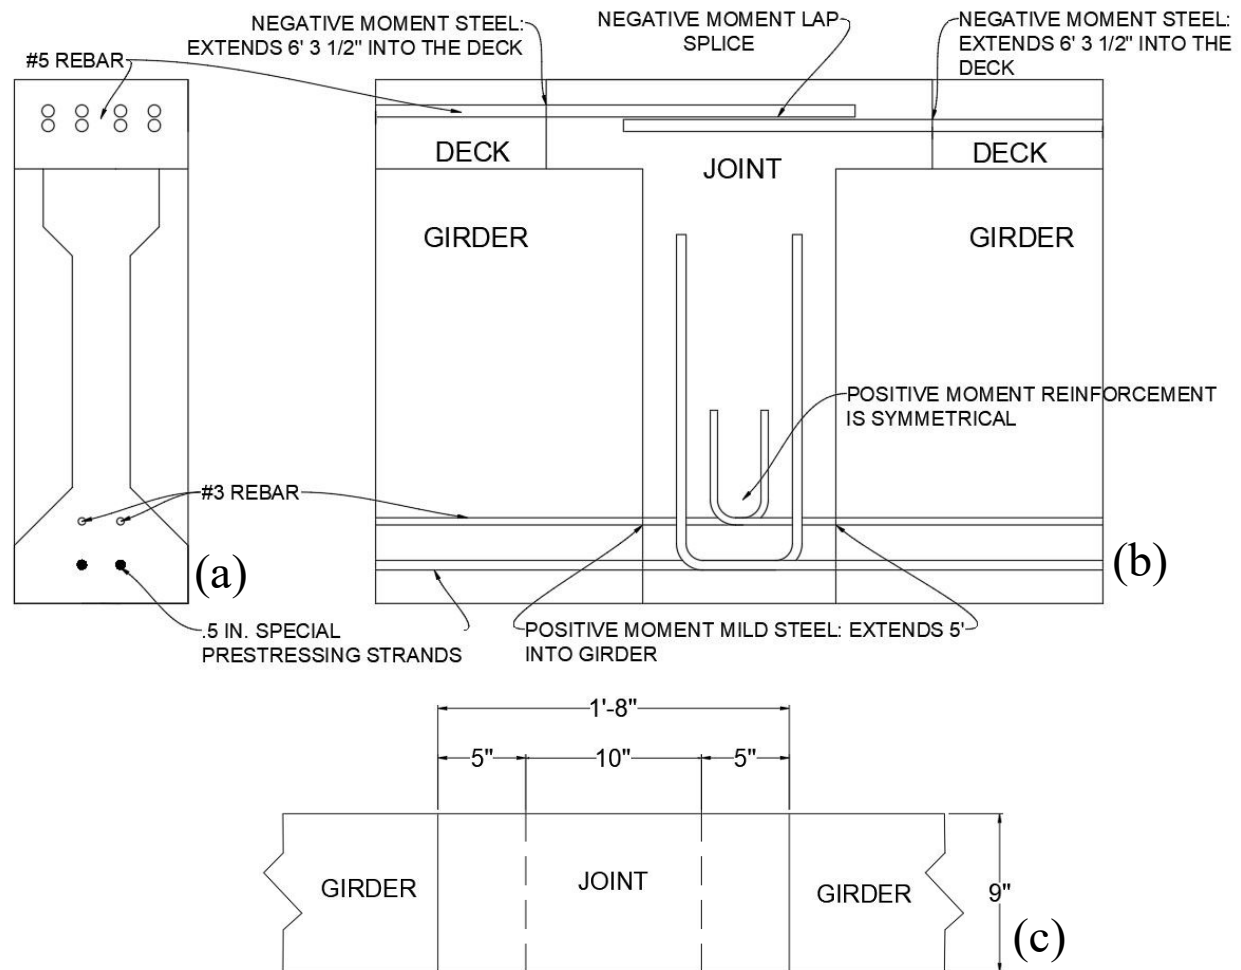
Newly constructed continuity joint cross-section (a), elevation view, (b), and plan view (c).
